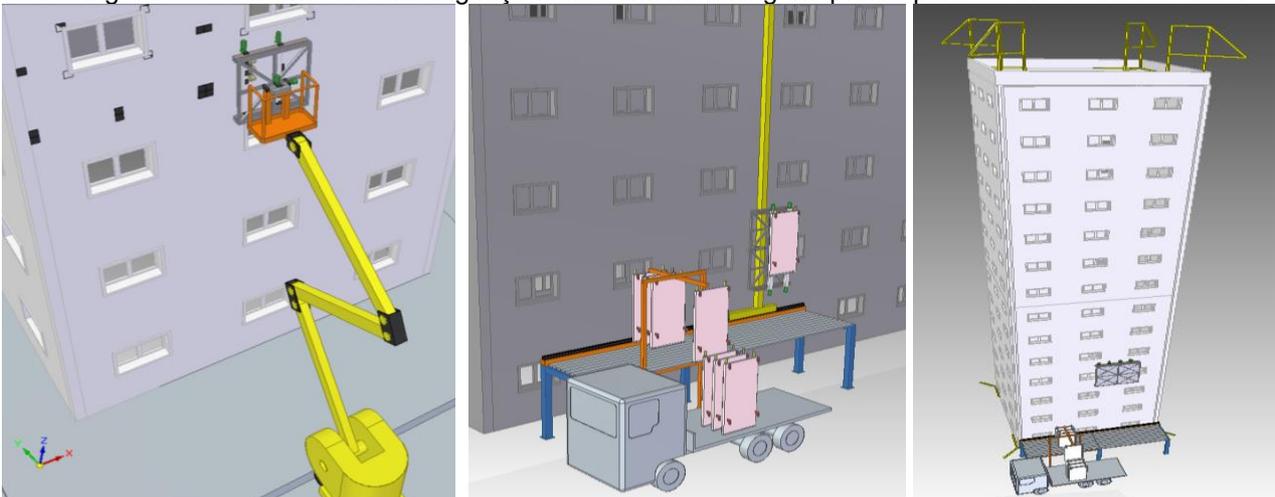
(left): Connector fixation process with an Aerial Work platform. Figure 2 (middle):the MEE is used by an Automated Vertical Bridge crane. We can see the MEE elevating the façade component. Figure 3 (right): It also has been considered the choice of using the MEE as a cable suspended device.
